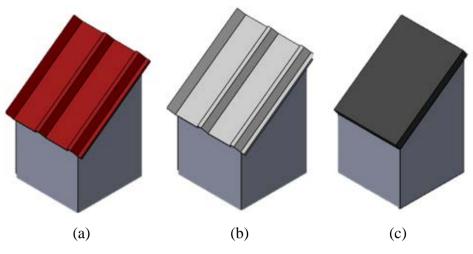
Roof Models in Solidworks (a) Roof Design I (b) Roof Design II (c) Roof Design III.
